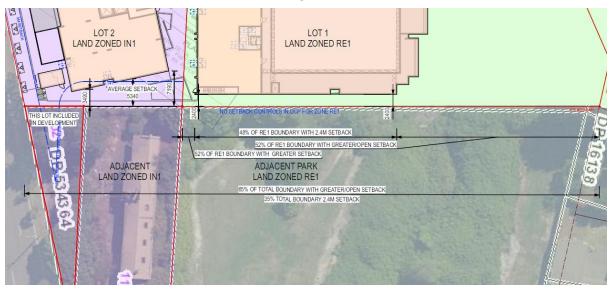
Lot 1 and Lot 2 Setback Diagram (Source: Drawing No. DA\_154 – Bennett Murada Architects)
